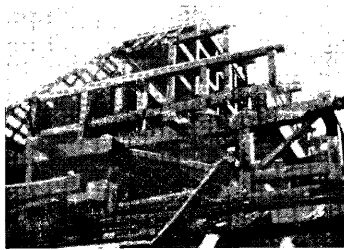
Roof failure due to uplift: traditional house.
